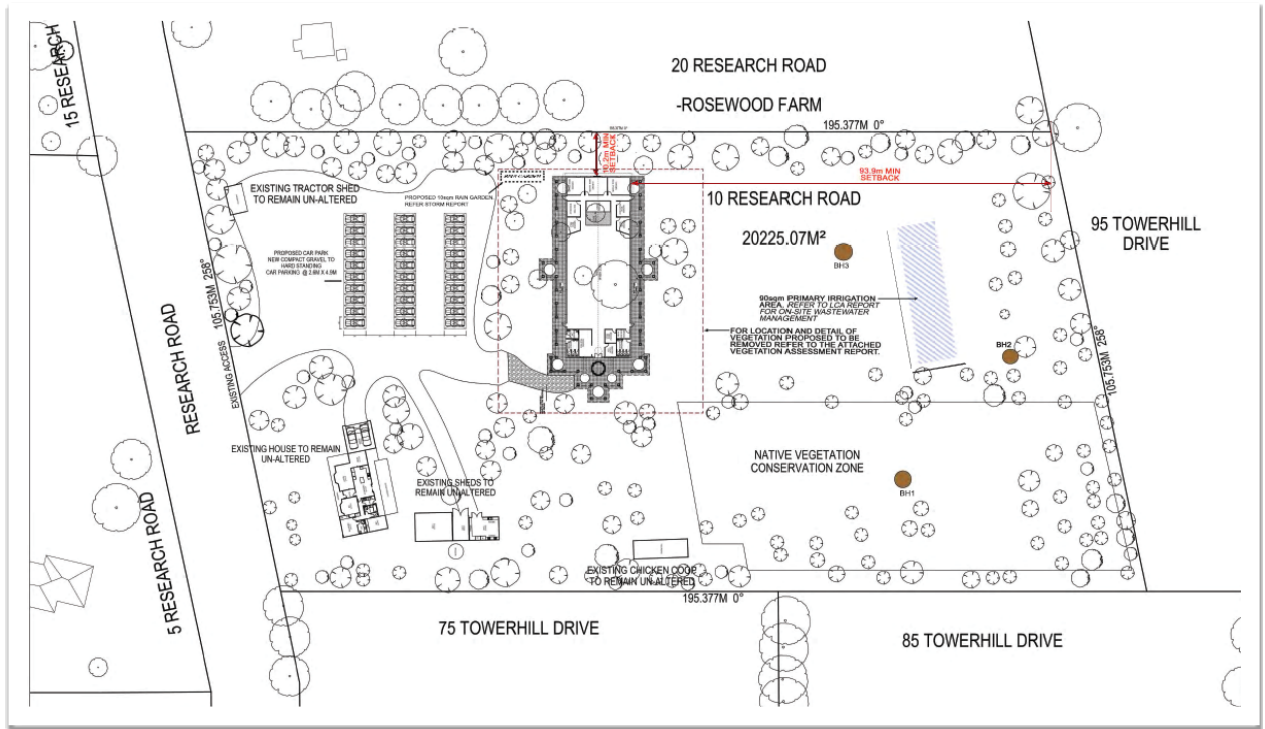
Proposed site plan. Source: Application plans submitted 13/09/2021
